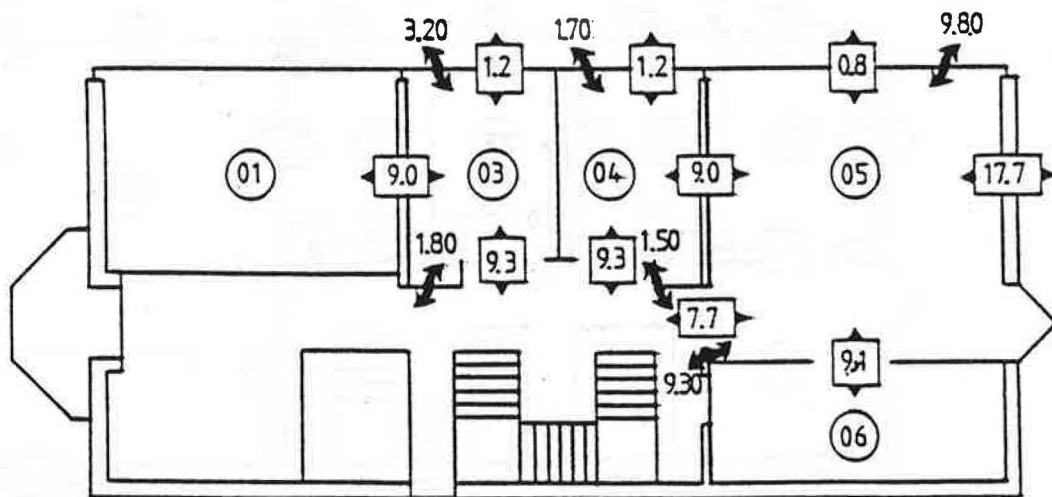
Thermal conductances in [W/K] between rooms and also with outside. First floor.
